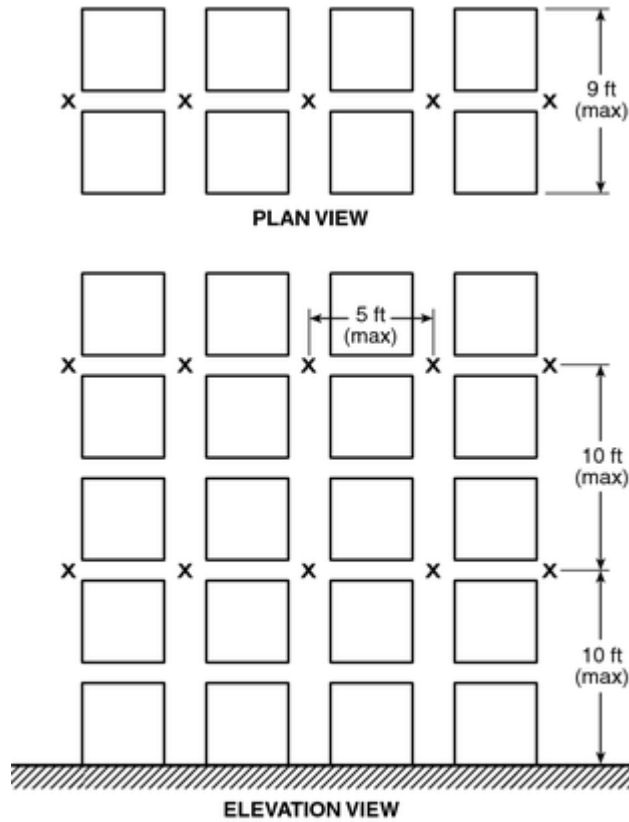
(a) Double-Row Rack Sprinkler Layout G.
